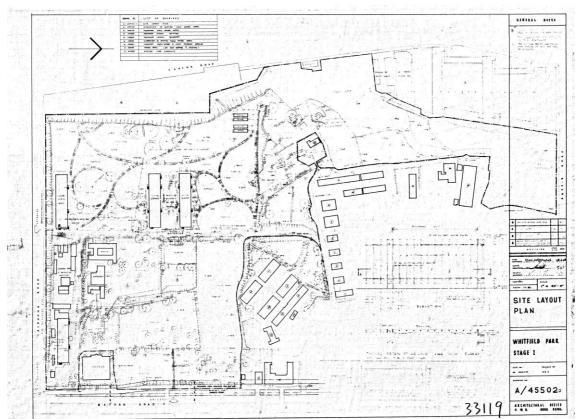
Whitfield Park Stage 1, Site Layout Plan, Drawing No. A/45502D, first issued in March 1969, revision D issued on unknown date. (Source: Architectural Services Department, Microfilm No. 33119)
